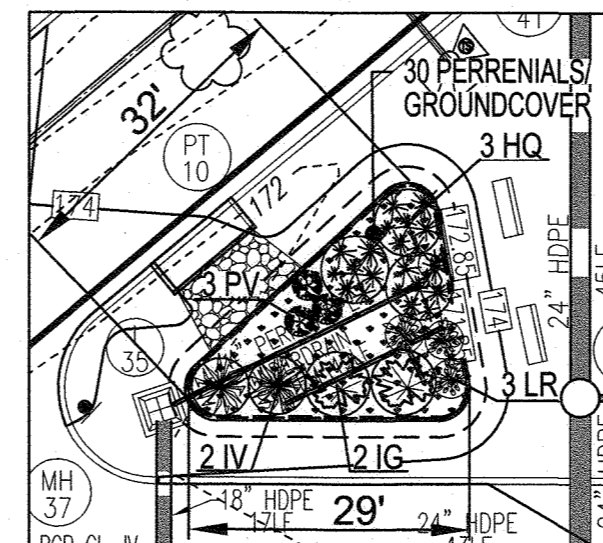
DETAILED BIO AND PLANTING PLAN (SWM #22)
